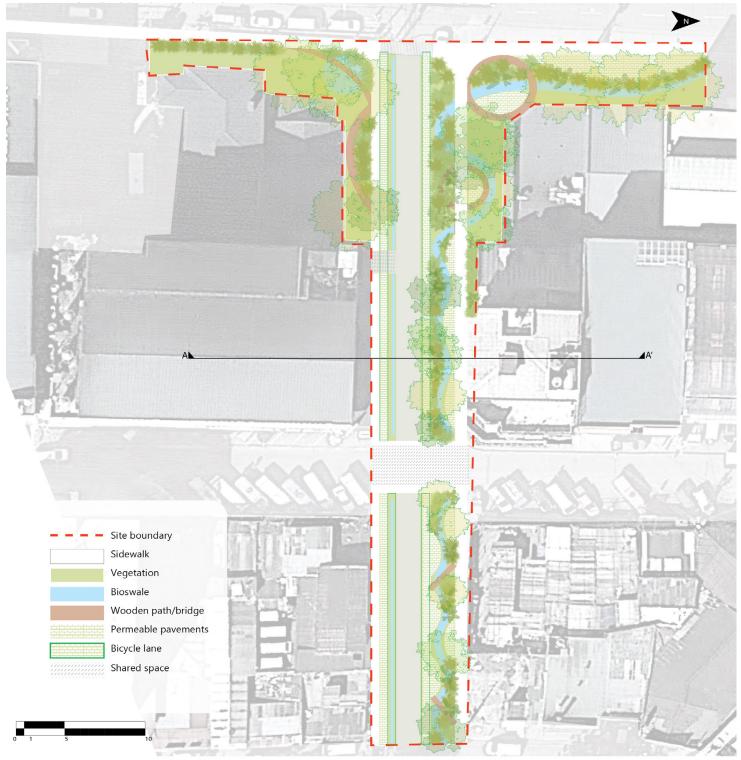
Plan View of Green Street Conceptual Design at Carino St.
